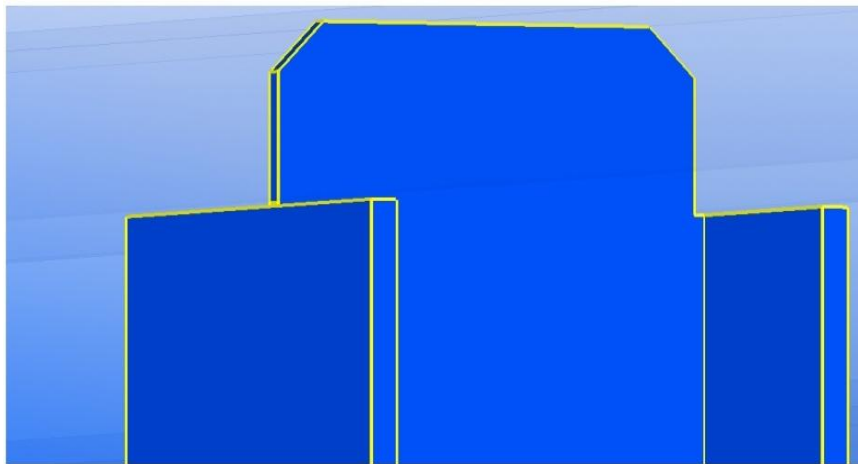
Cuts for welds (Structures, Tekla.)
